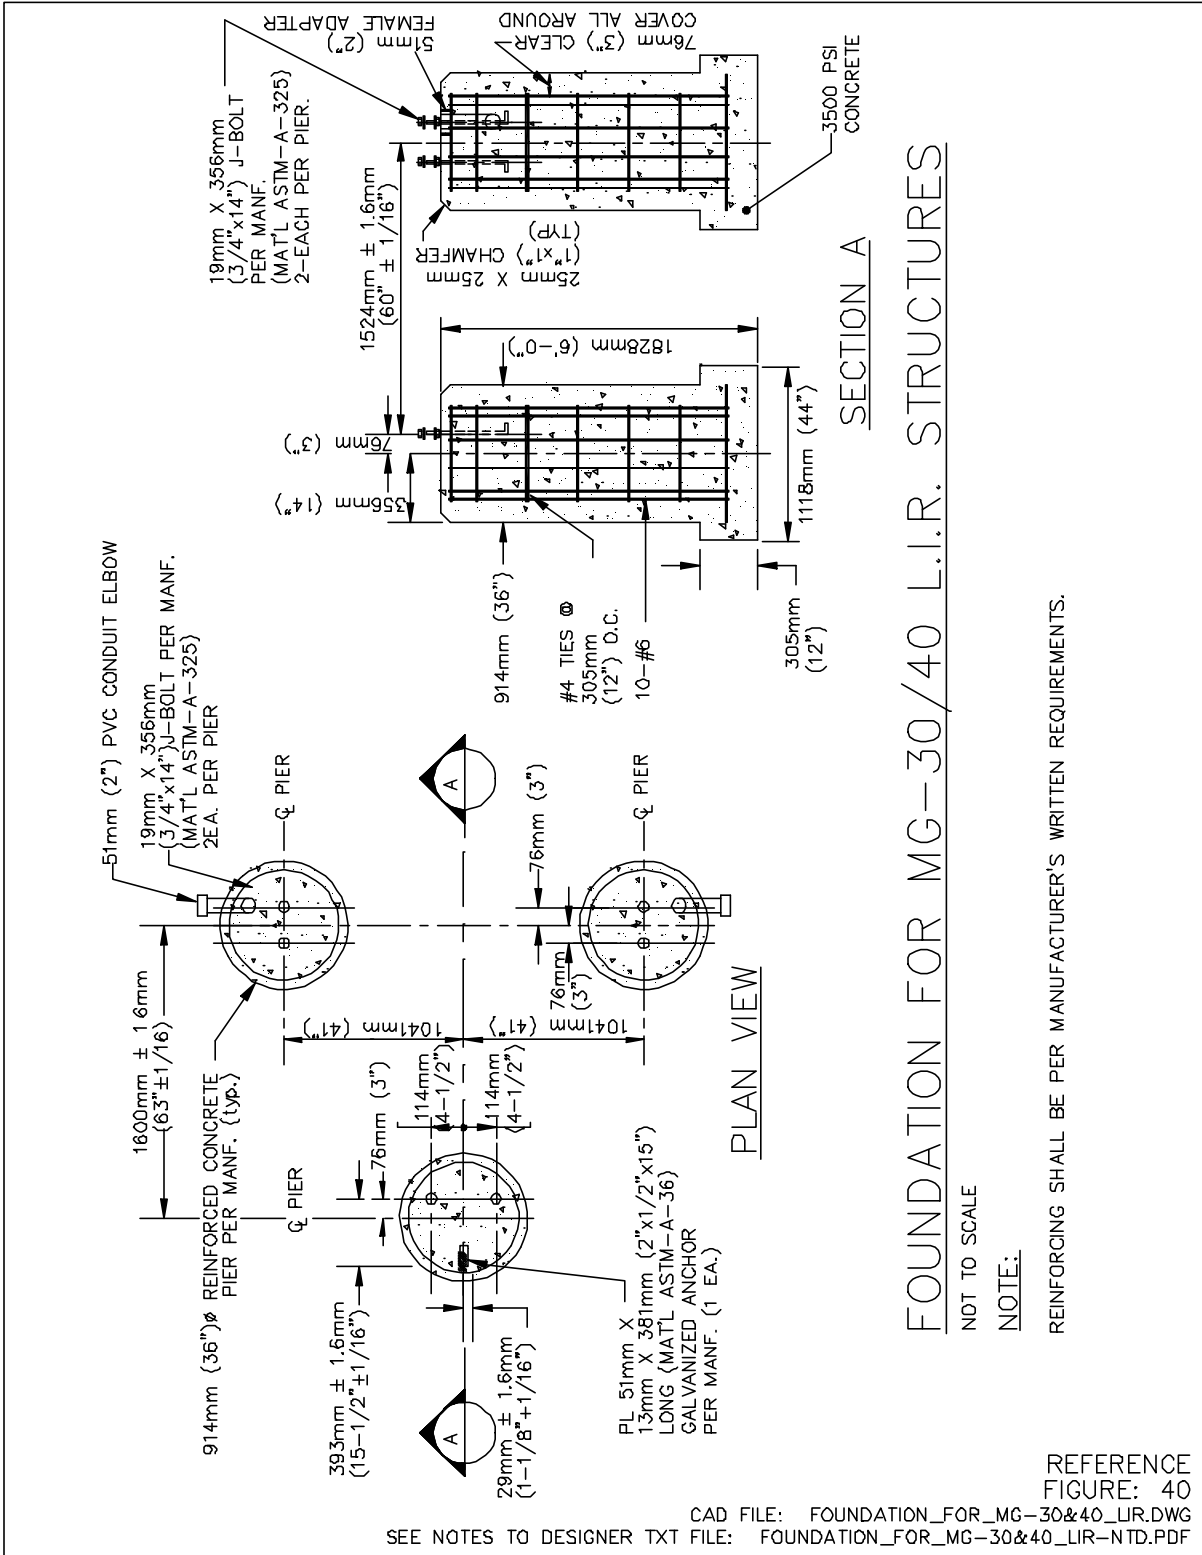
Foundation for MG-30/40 L.I.R. Structures
